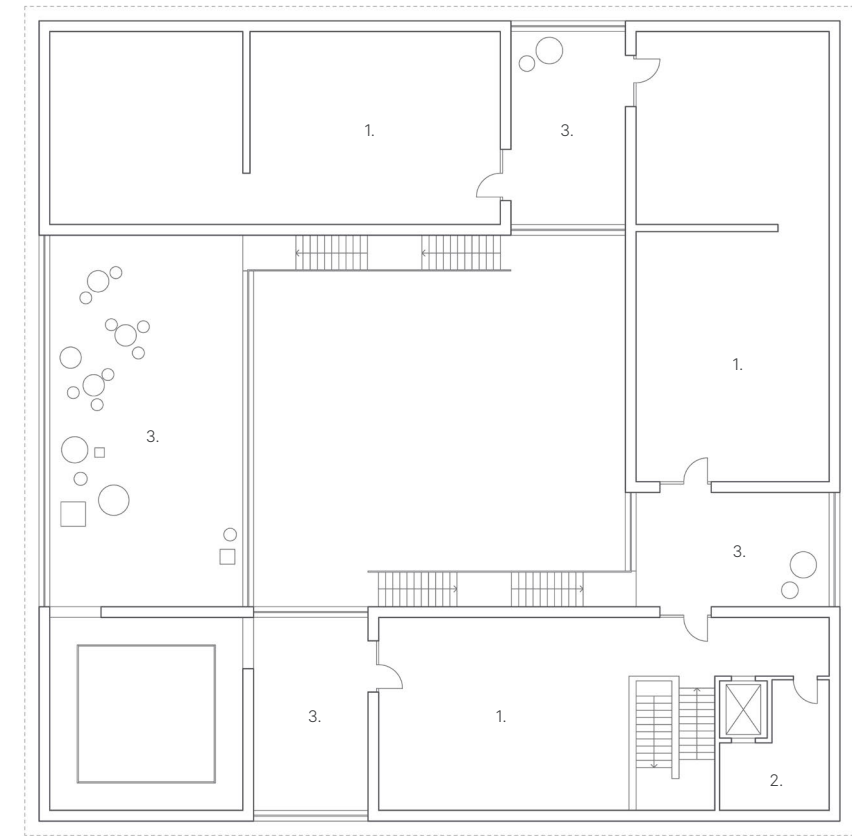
First Floor Plan. 1. Exhibition Space 2. Storage 3. Rooftop Terrace.
